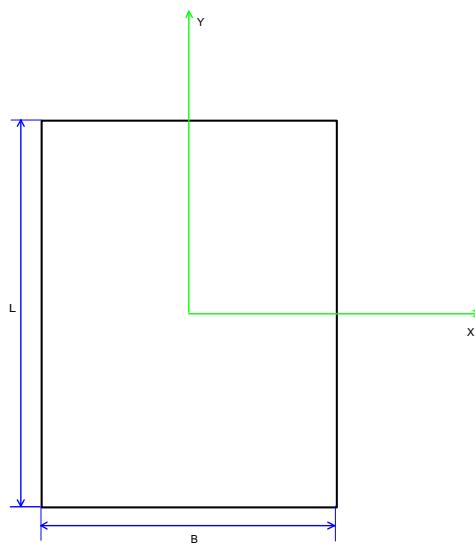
Notation for Rectangular Loaded Area Shown in Plan View
